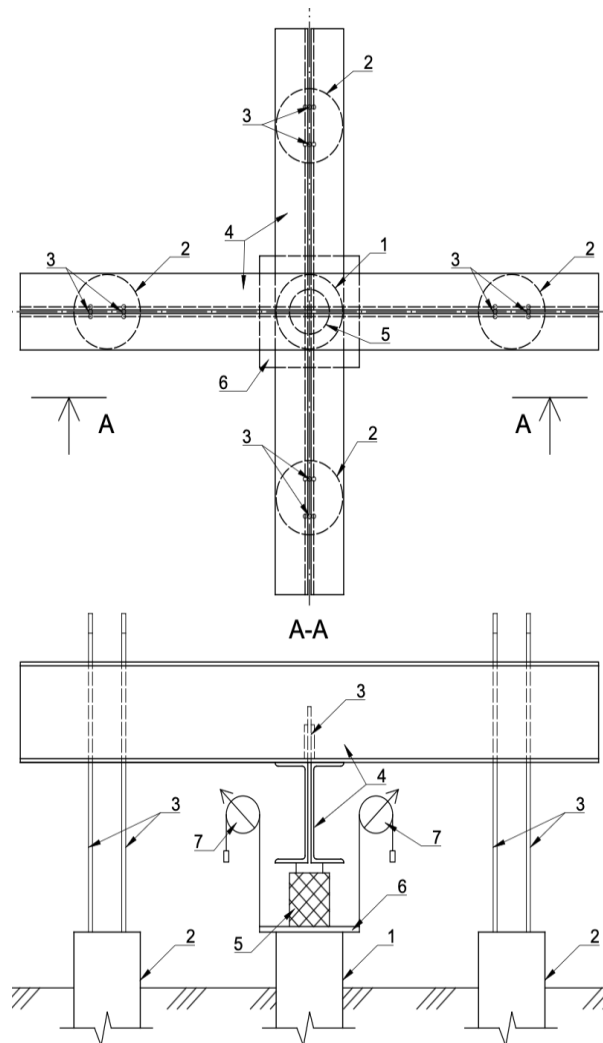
Diagram of the test bench 1 – test pile; 2 – anchor piles; 3 – reinforcing bars; 4 – distribution beams; 5 – hydraulic jack; 6 – base plate; 7 – Aistov's deflectometers 6PAO
